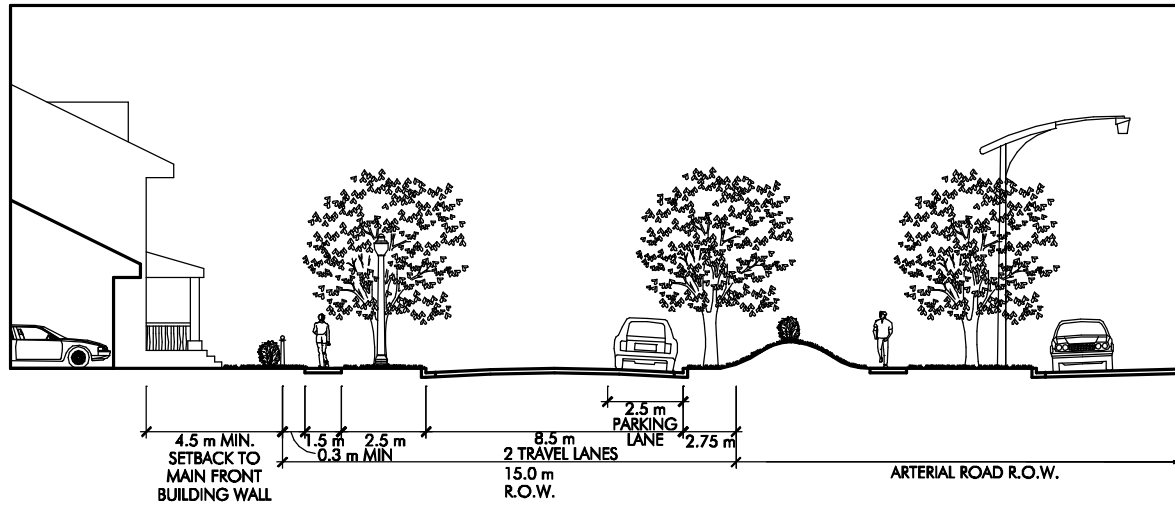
Single loaded local road or parallel service road, adjacent to an arterial road
